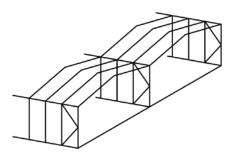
Vertical bracing in the walls and in the planes of the valleys (plan bracing omitted for
